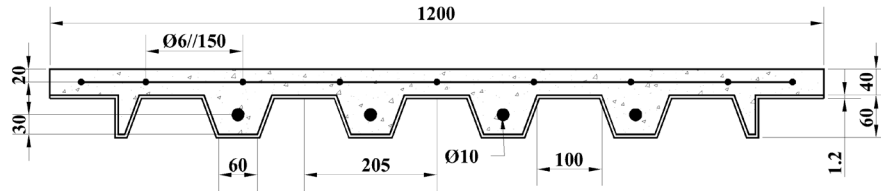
Composite slab model made with H60 trapezoidal steel deck
